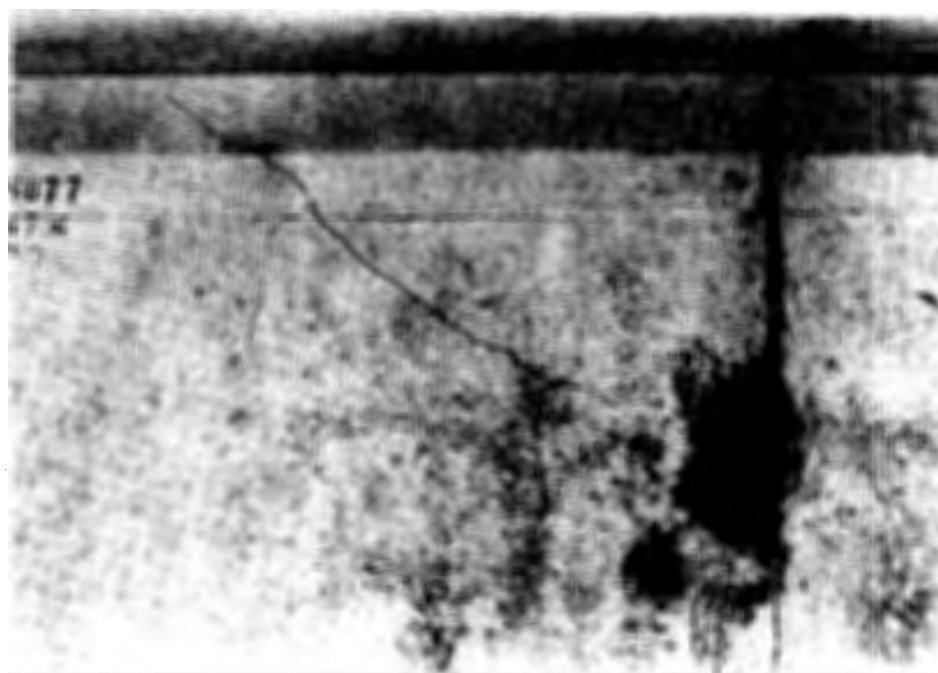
Severe concrete cracking inside segmental boxes.
